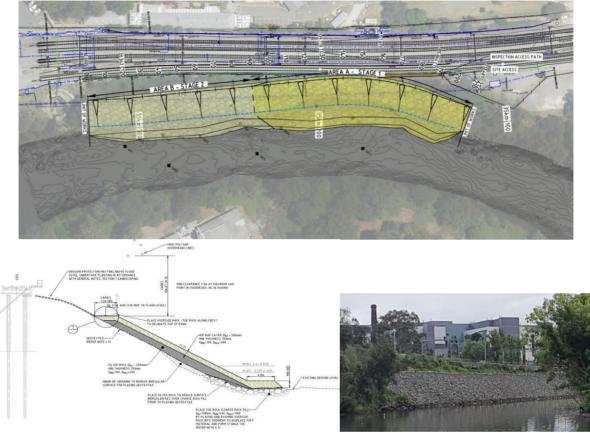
Revetment stabilisation section of the railway line embankment opposite Moore Point (Source: Jacobs)
